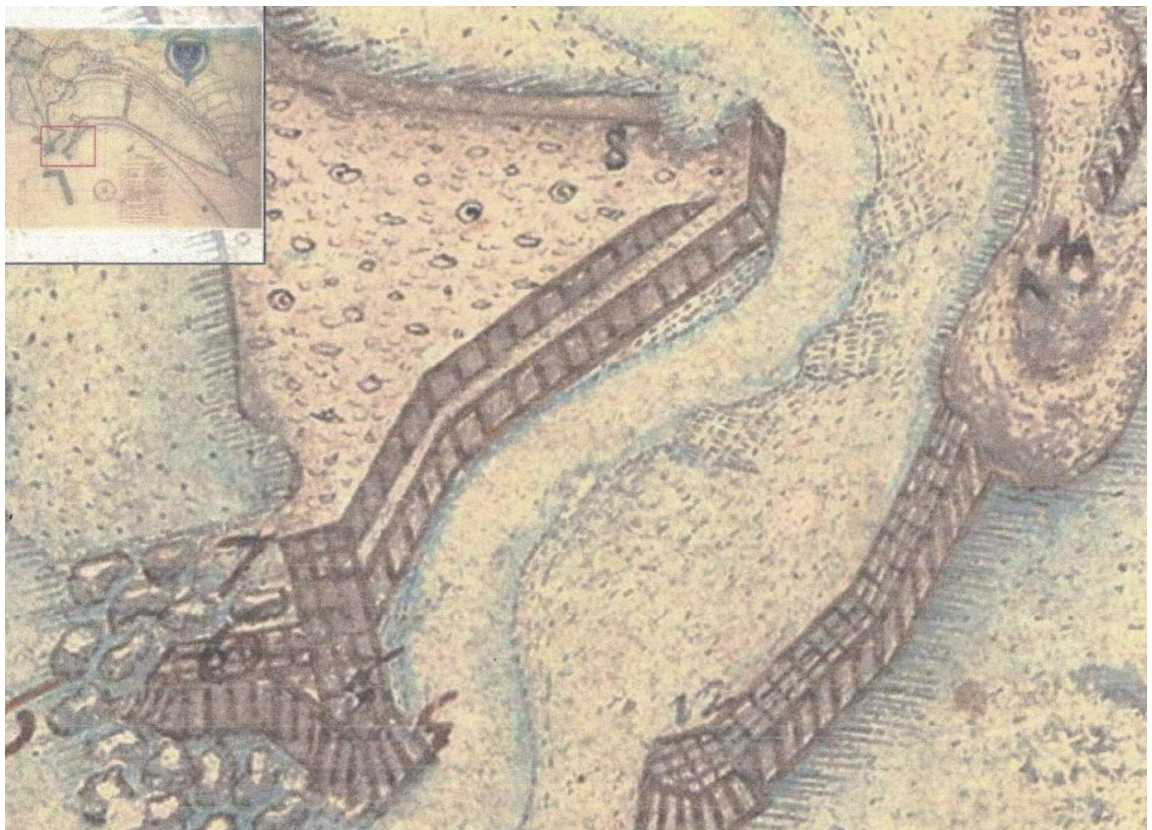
, Detail of the piers of Dover harbour in 1595 by Thomas Digges. (full plan in inset) (British Library: Cott Aug I.i.46.)
